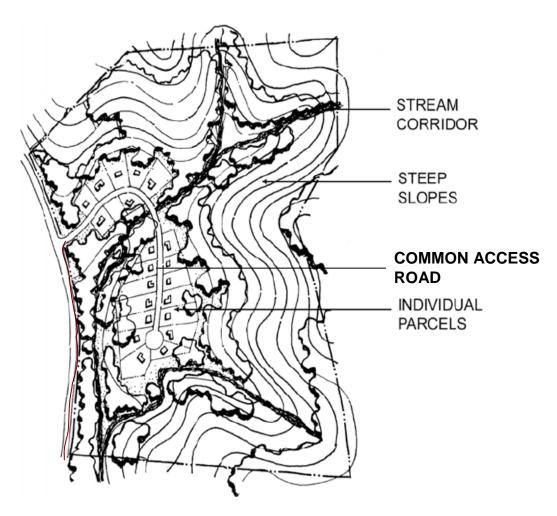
Where a subdivision is proposed, use common driveways and cul-de-sacs to minimize the need for grading for multiple driveways.
